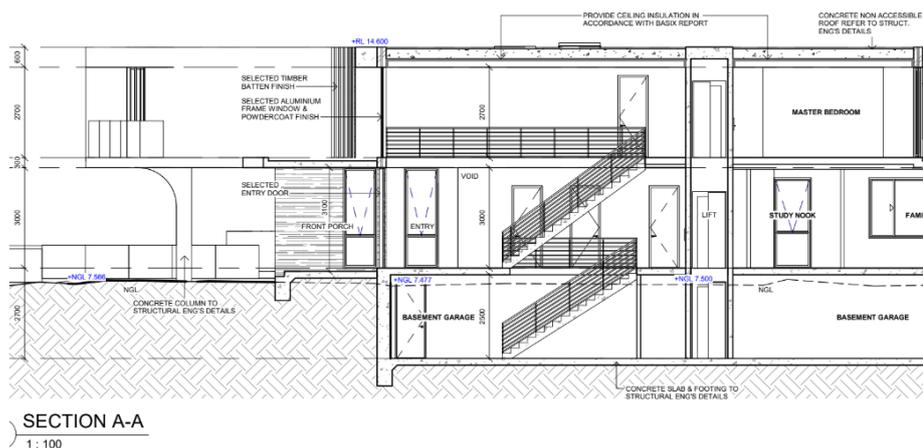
Extract of section plan indicating location of approved void above staircase (Source: Resolut, 2024).
